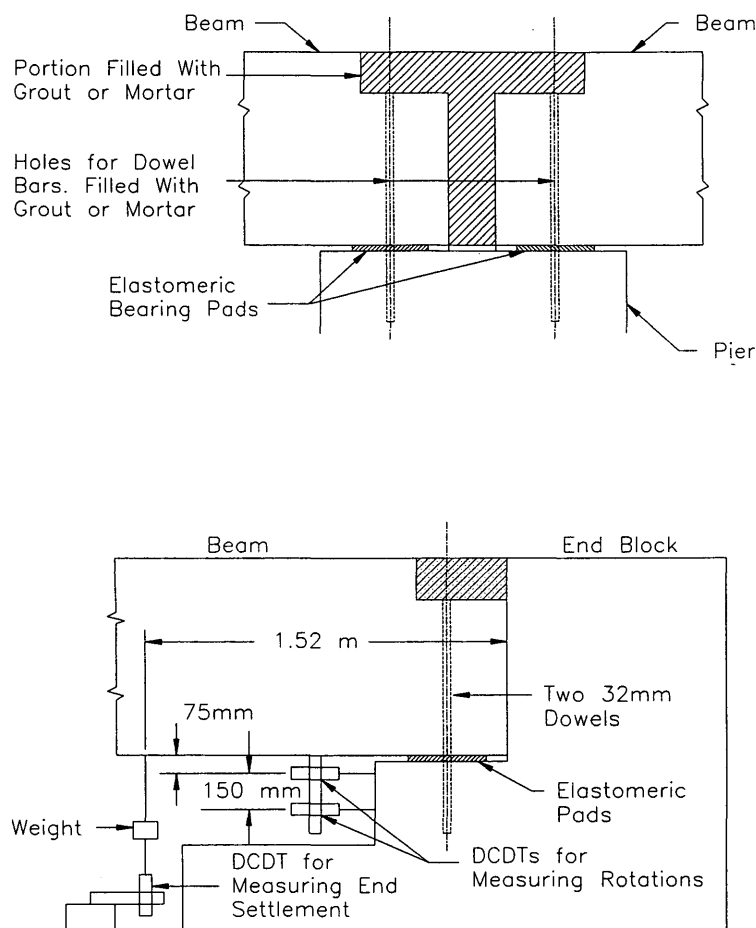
Support condition on original bridge and support block and instrumentation for test.
